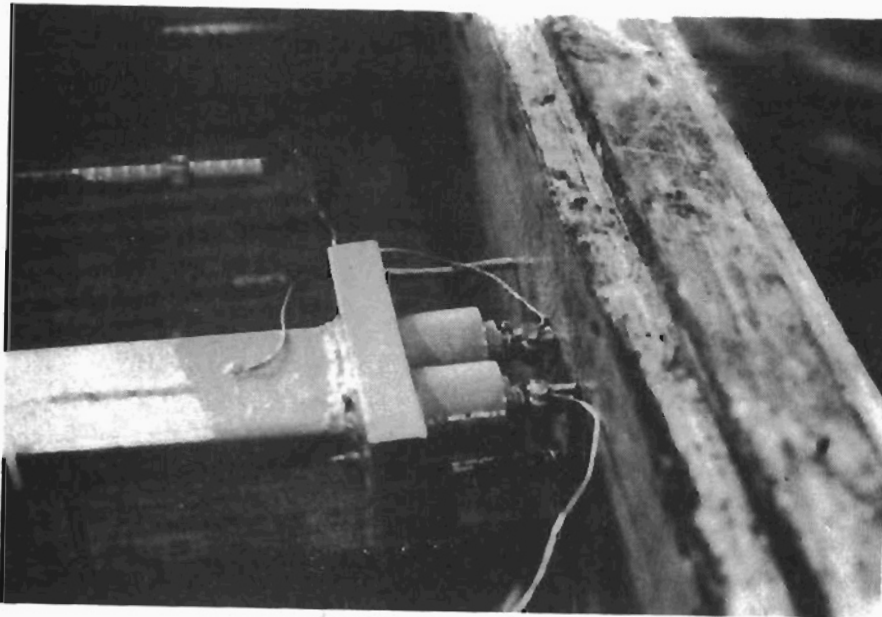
Cast-in dead end anchorage and chucks for grouted
